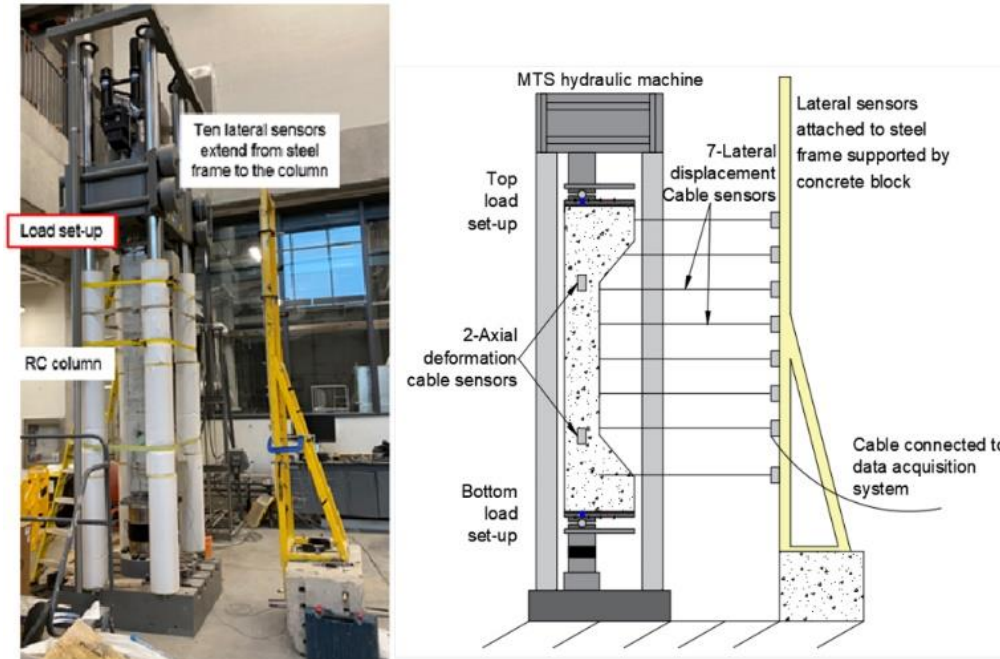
Loading test set-up using MTS hydraulic machine
